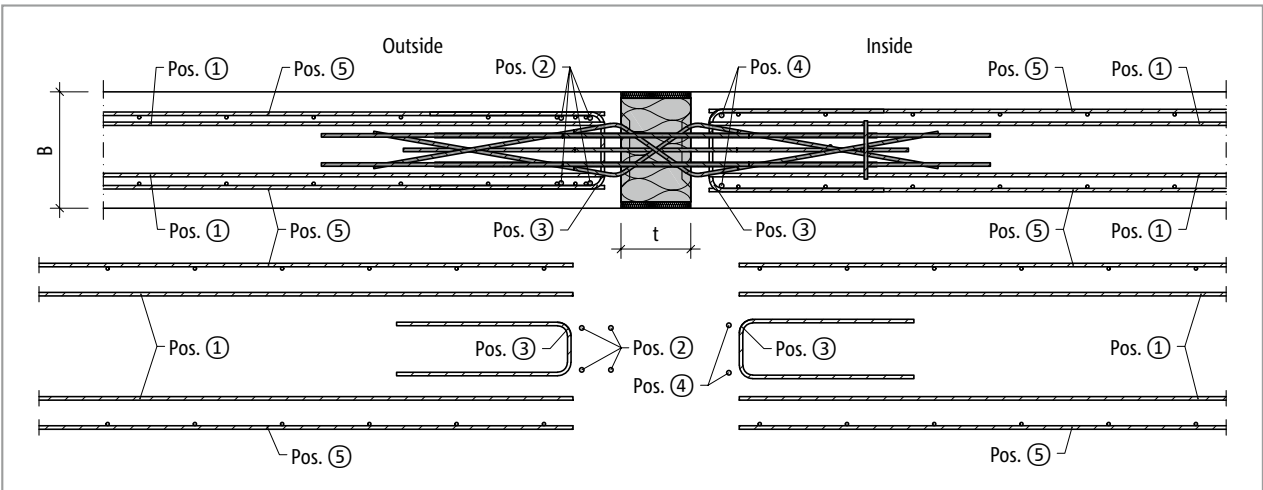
Schöck Isokorb® XT type W: On-site reinforcement; plan views
